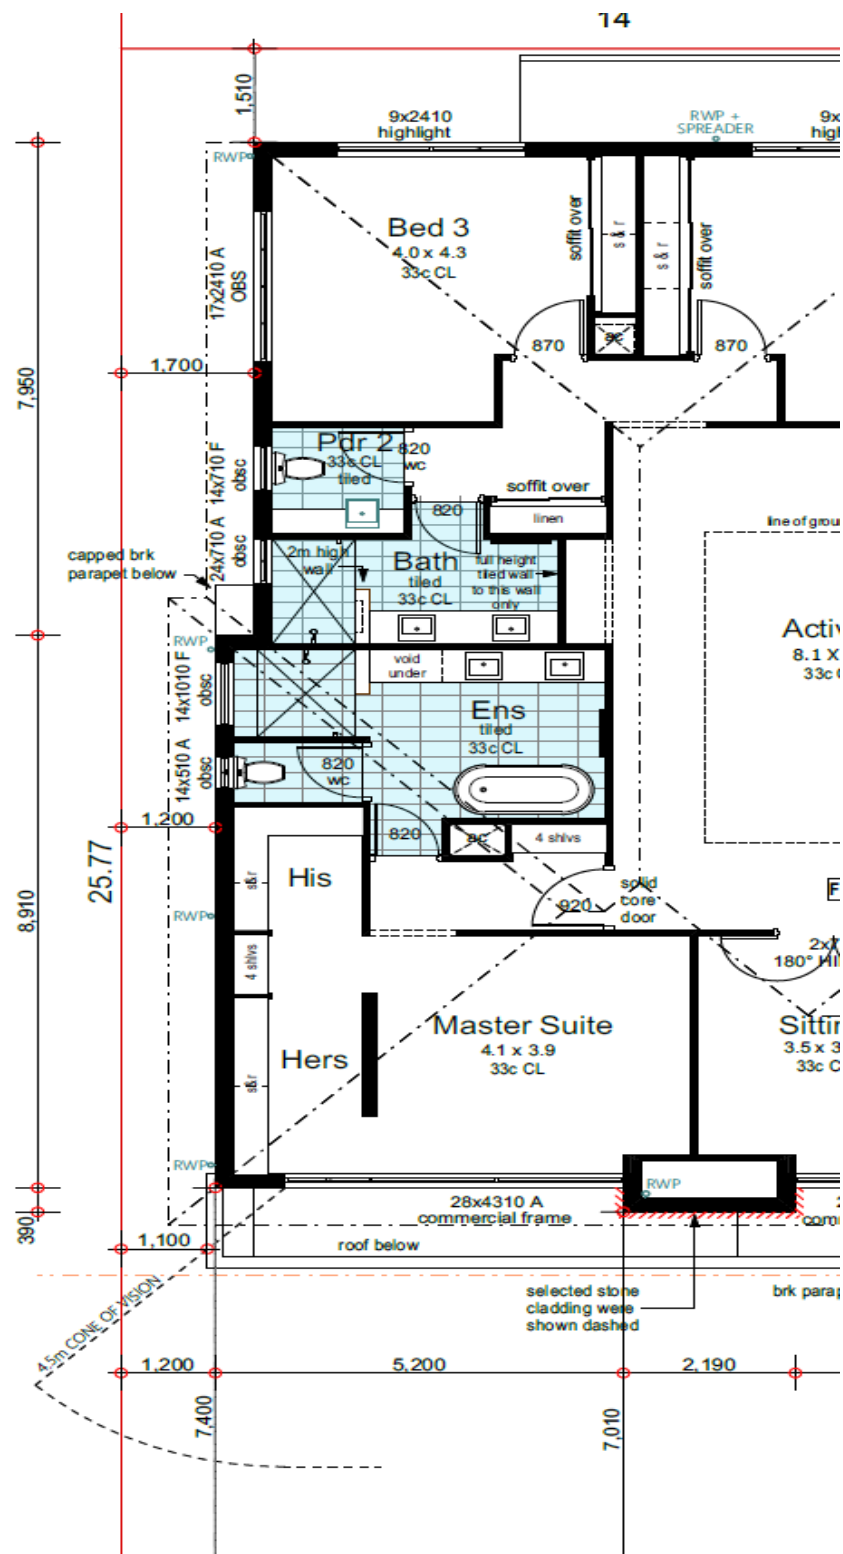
Proposed Upper Floor Plan with Setbacks to Southern Property to Left of Image
